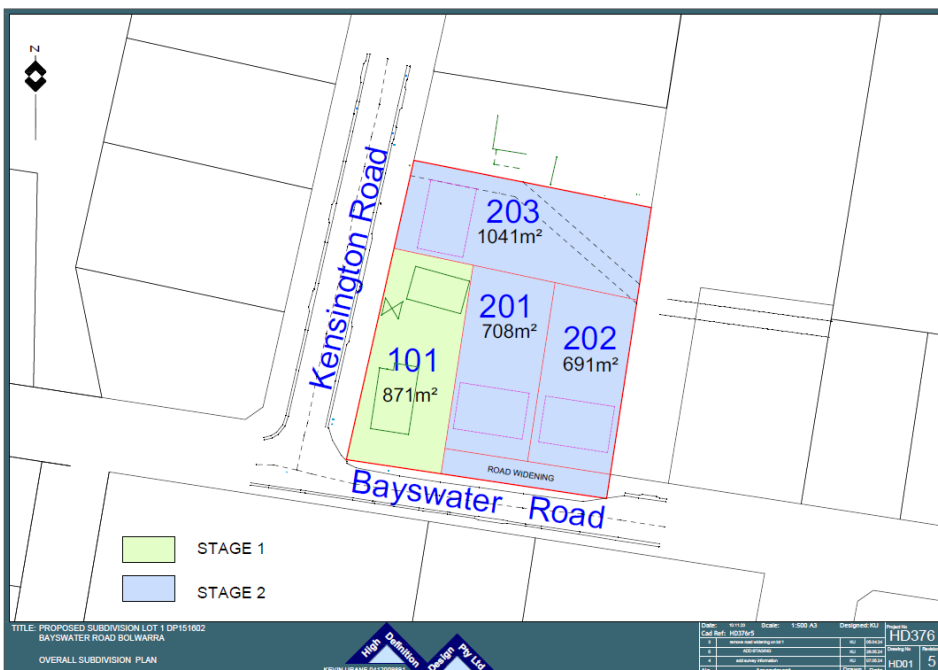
Plan of subdivision (High Definition Design Pty Ltd)
